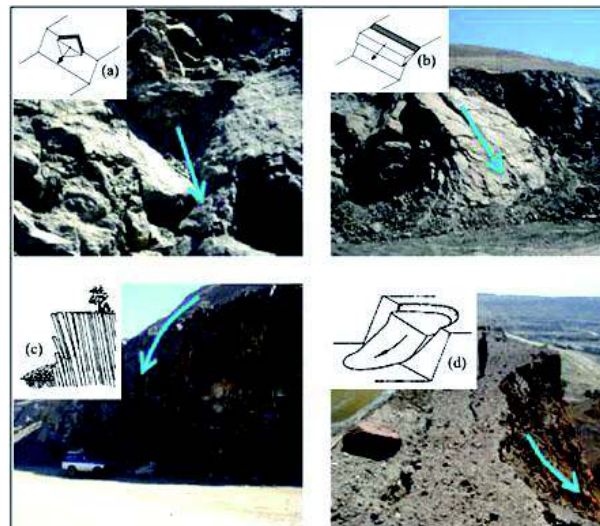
Types of failures occurred on the pit wall of Gole Gohar iron mine. (a) wedge failure, (b) planar failure, (c) toppling failure and (d) circular failure(Hasanpoor,2010).
